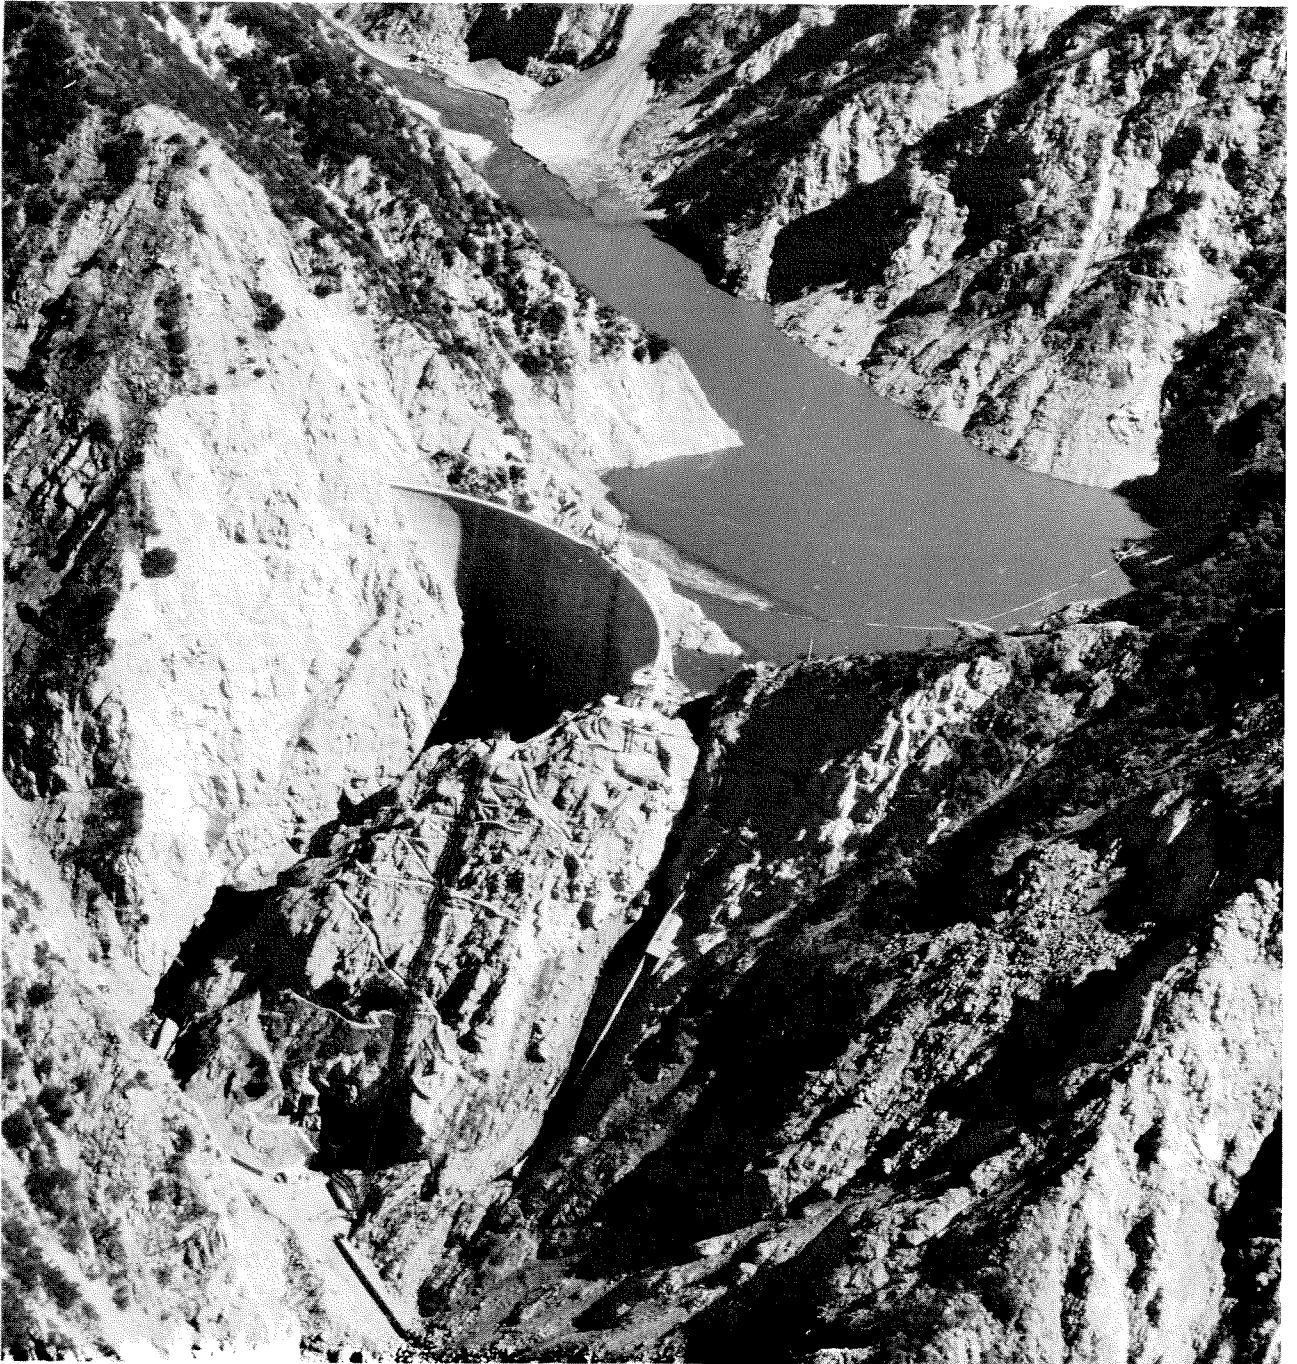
Near view of Pacoima Dam looking northeast. The small white accelerometer house is to the left of and adjacent to the larger white water tank on top of the ridge to the right and above the near abutment. This 372 ft high concrete arch dam was constructed in 1928. The dam was not damaged by the earthquake. Another view of the dam is shown in the paper by Hudson and Trifunac.
